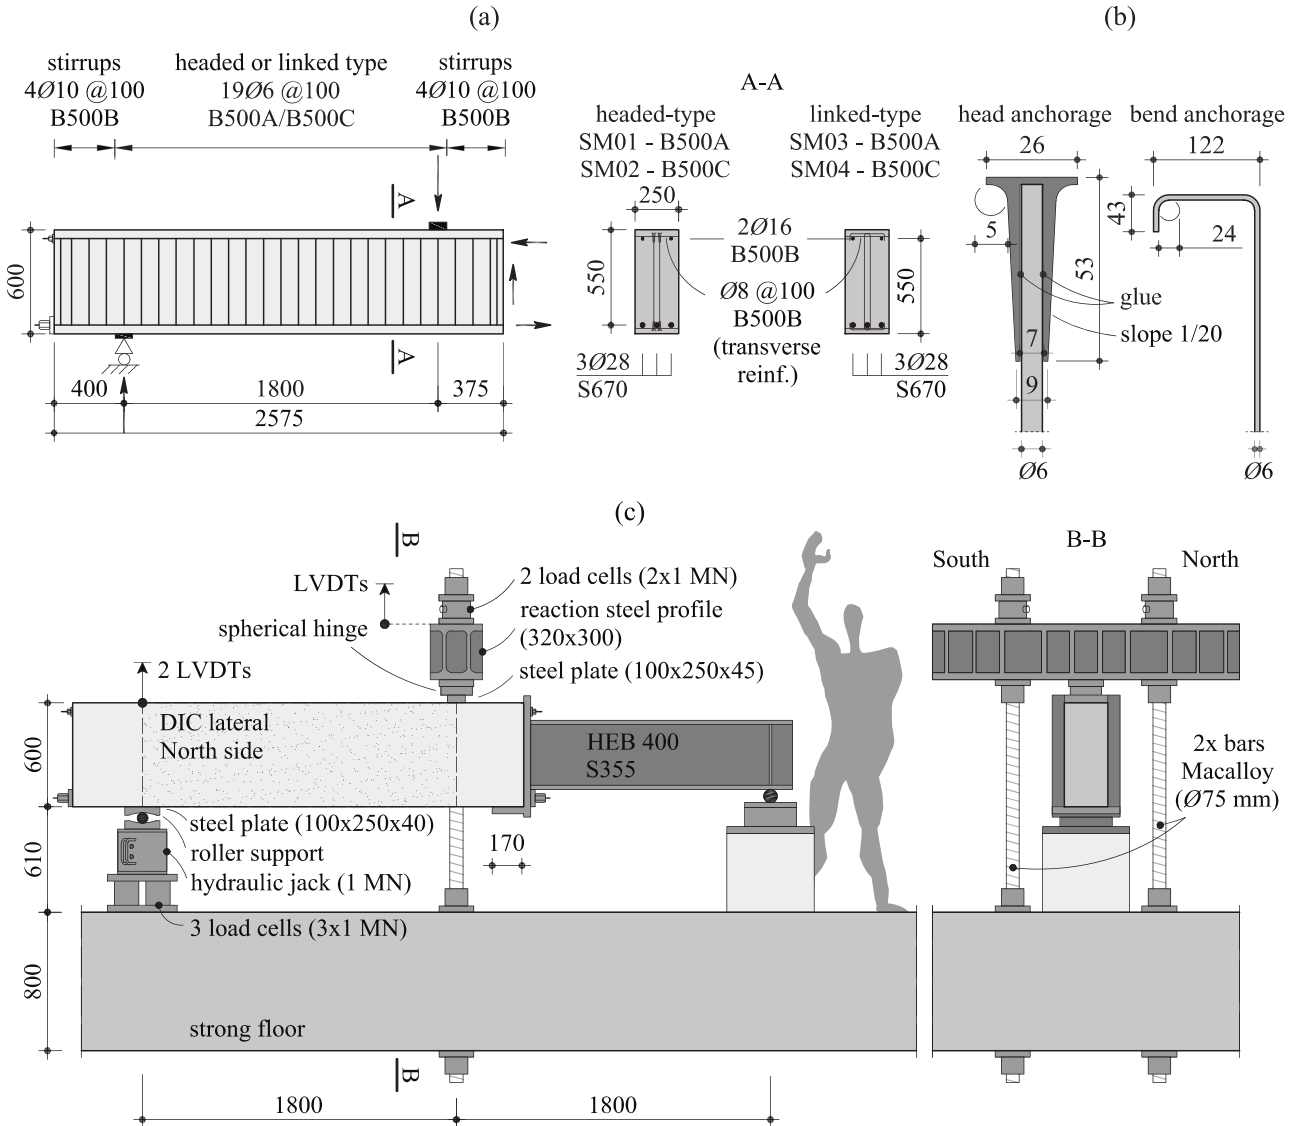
Geometry with reinforcement layouts (a), shear anchorage detail (b) and test set-up (c) of the SM00 specimens. Monney (2022) [14]
